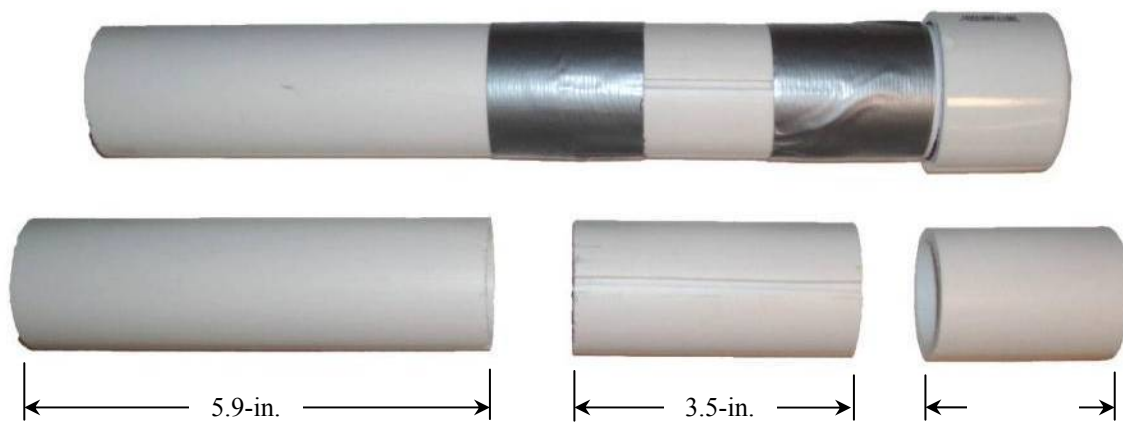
The three sections of PVC piping alongside a completed mold which was used during the casting of a grouted ACT specimen.
